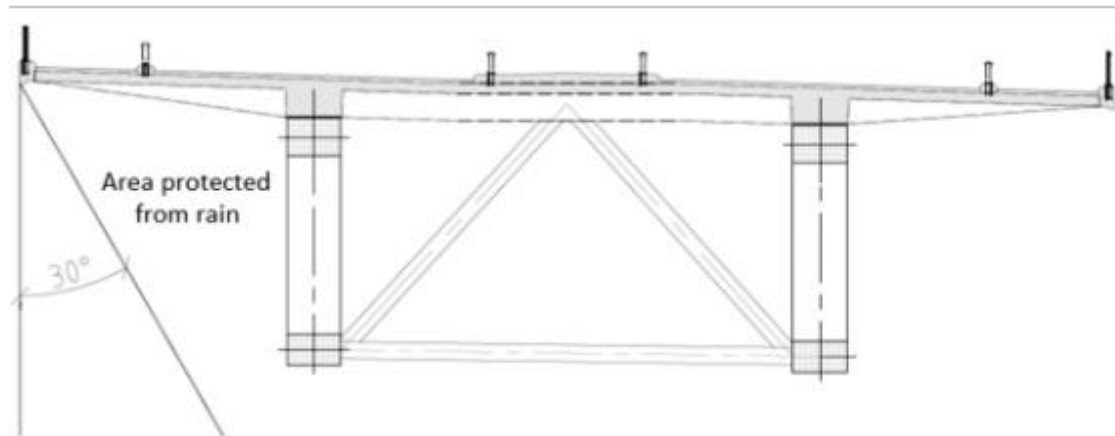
Cross-section of the timber bridge design for Mjøsa bridge [71]
